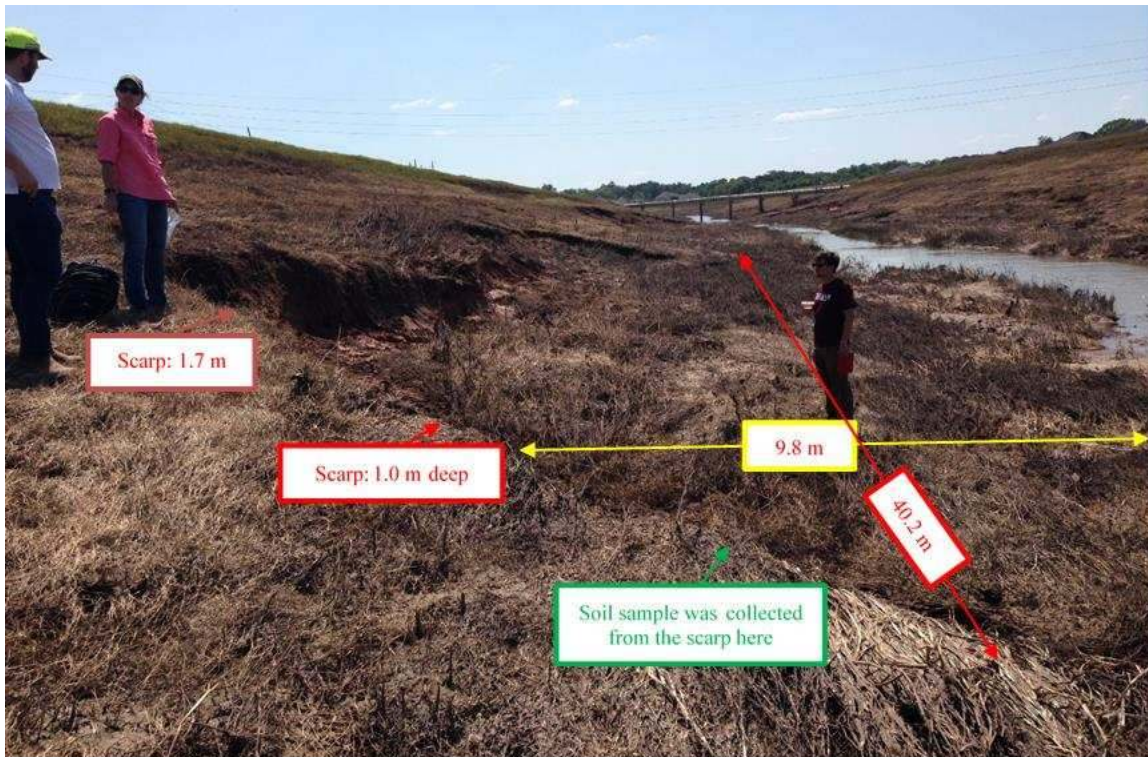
Slope failure north of damaged drainage pipe on the east side of ditch (September 10, 2017, 29.52647°N 95.56194°W),
